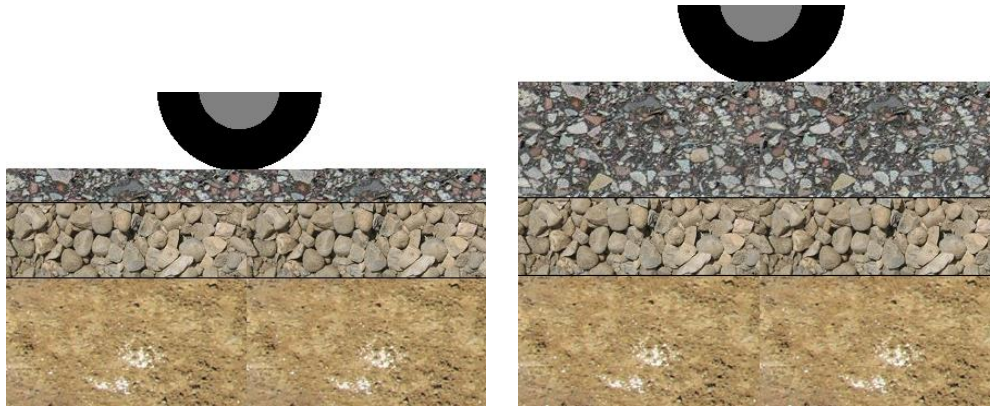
LVECD Thin and Thick Pavement Cross-Sections
